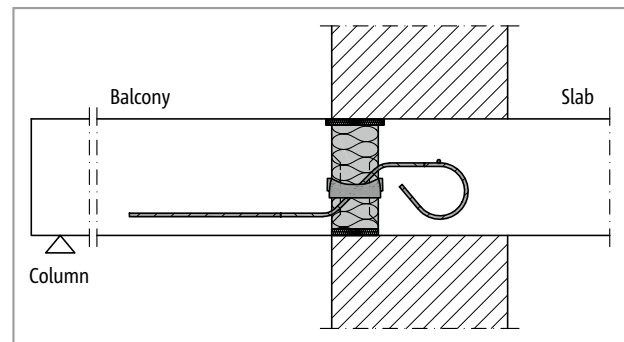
Schöck Isokorb® T type Q: Connection with thermal insulating cavity masonry (e.g. T type Q-V1 to T type Q-V5)
